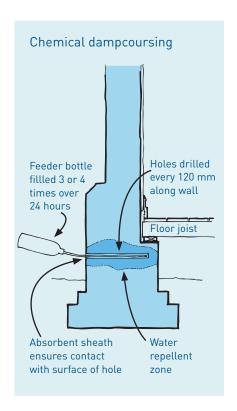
Chemical dampcoursing. Cross-section through a solid wall showing the gravity-fed system. Note that the new water-repellent zone should be installed below all floor timbers.
